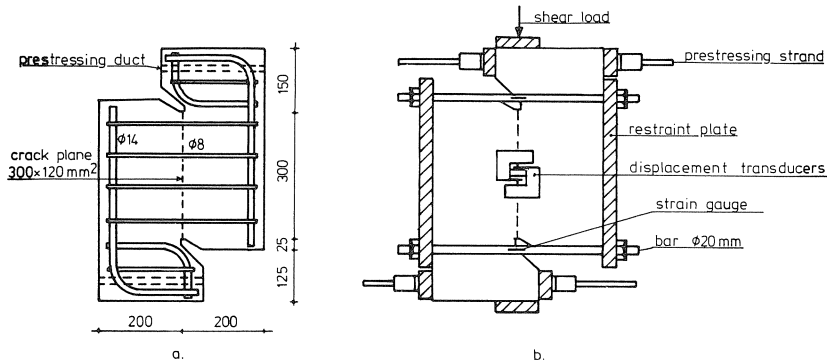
Test specimens used for tests on reinforced concrete (a) and plain concrete (b).
